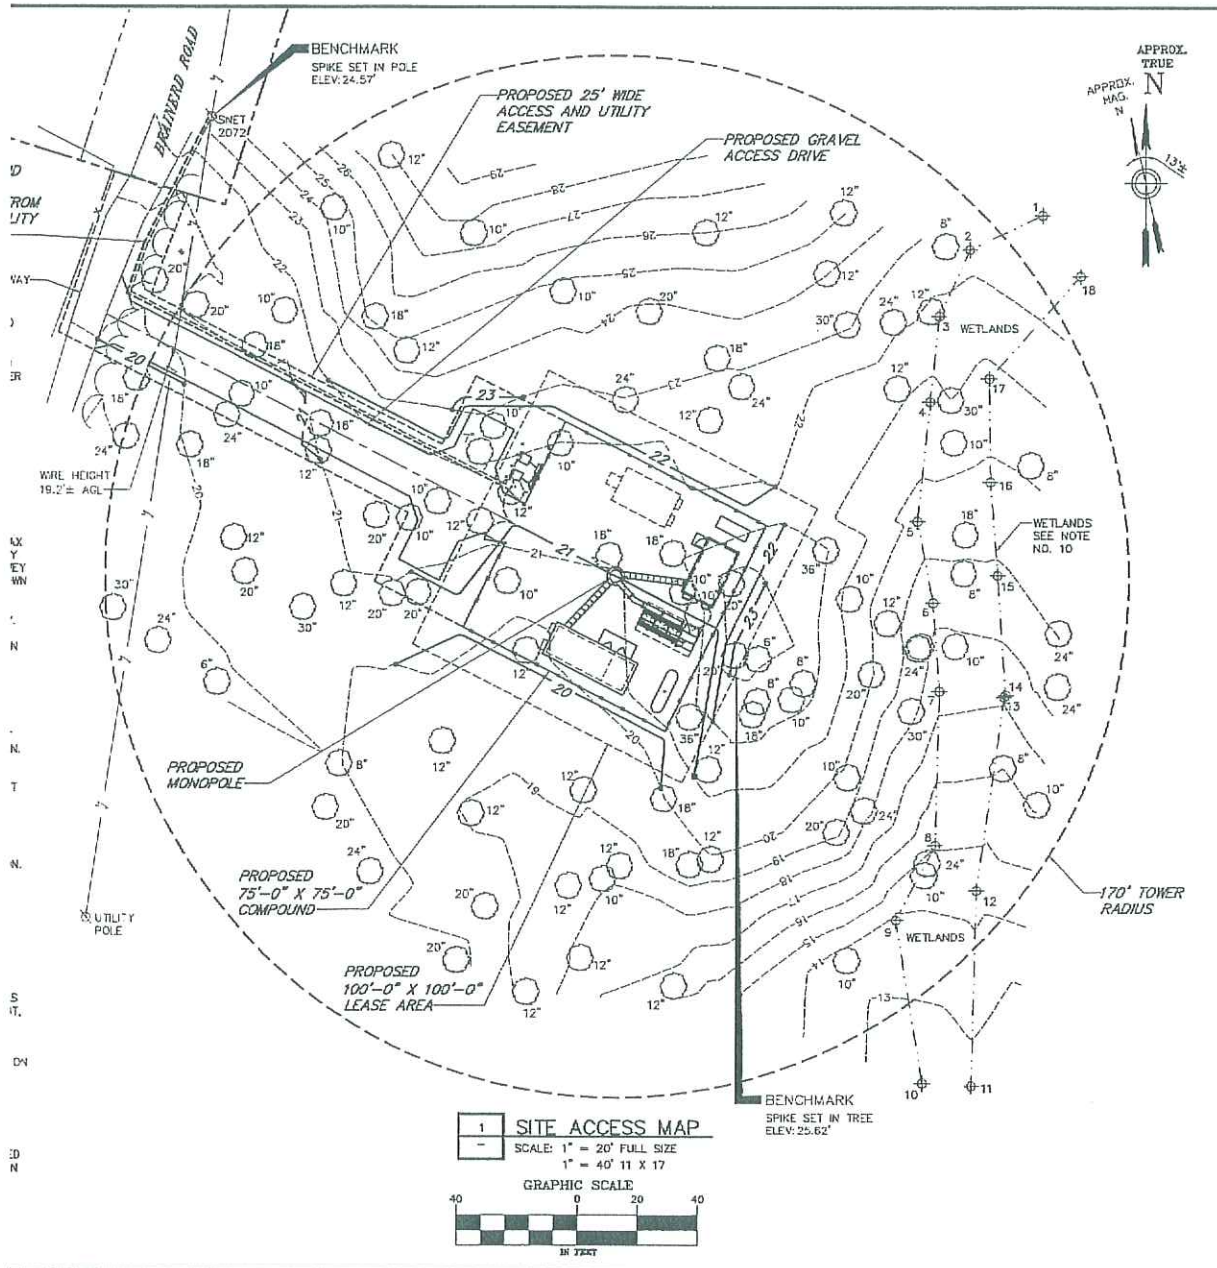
Location of site at 49 Brainerd Road, East Lyme (SBA 1, Tab B)
